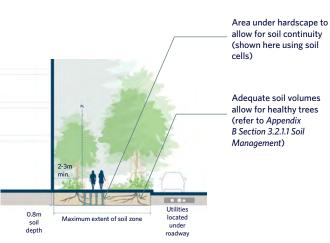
Tree and soil conceptual cross section, showing street tree planting and soil volume details
